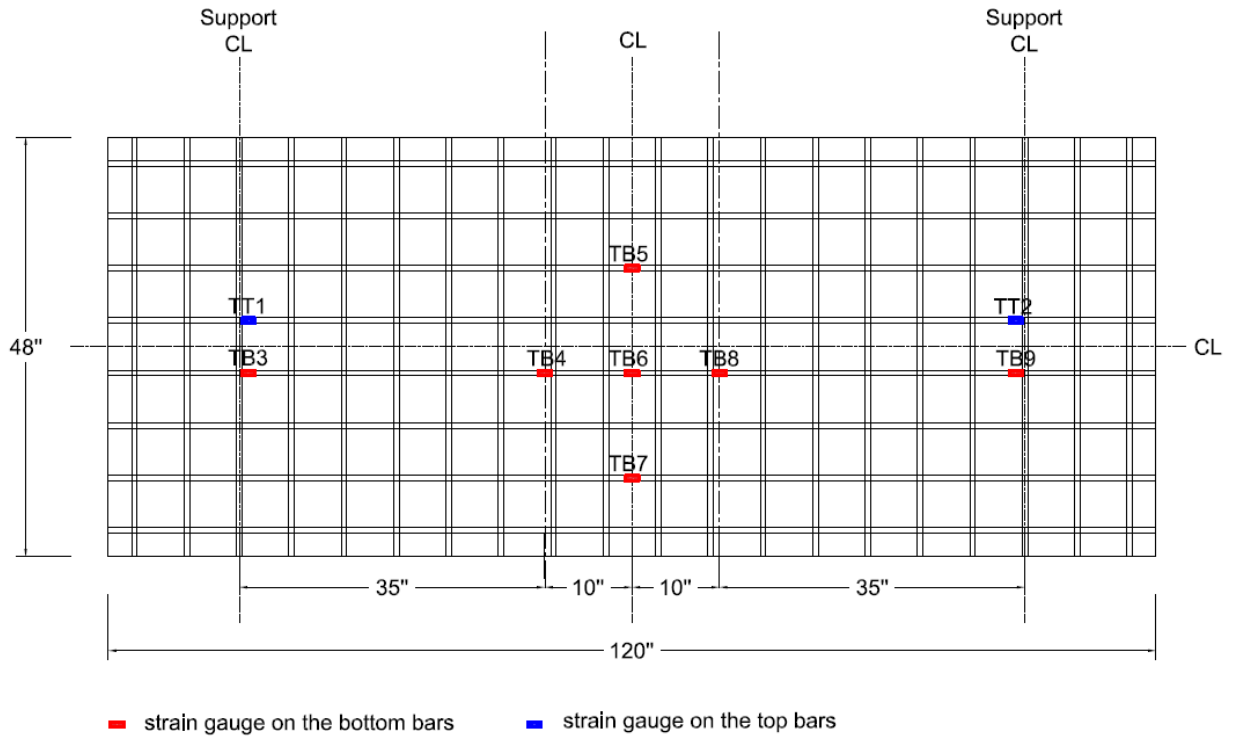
Reinforcement detailing of single-span bridge deck Prototype 2.
